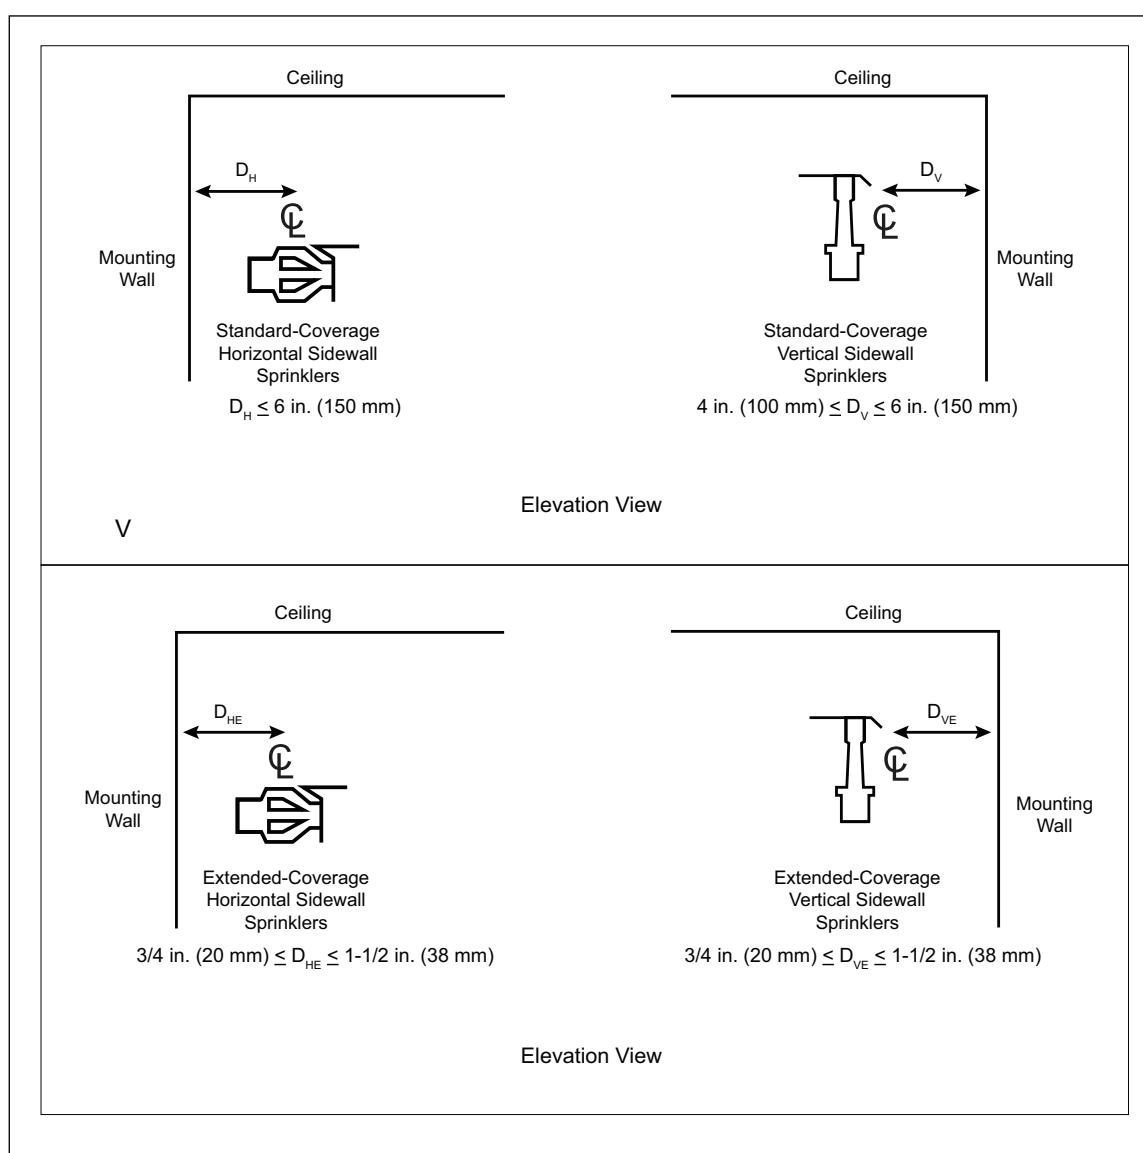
(a). Horizontal distances from Nonstorage sidewall sprinklers to walls
